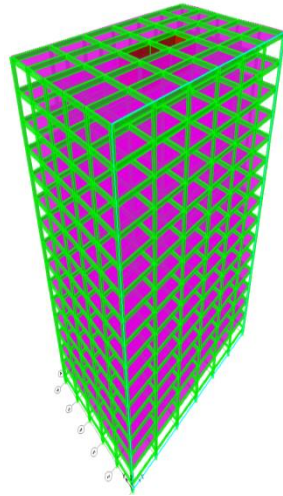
3D elevation of G+14 storey RCC building with CSW
